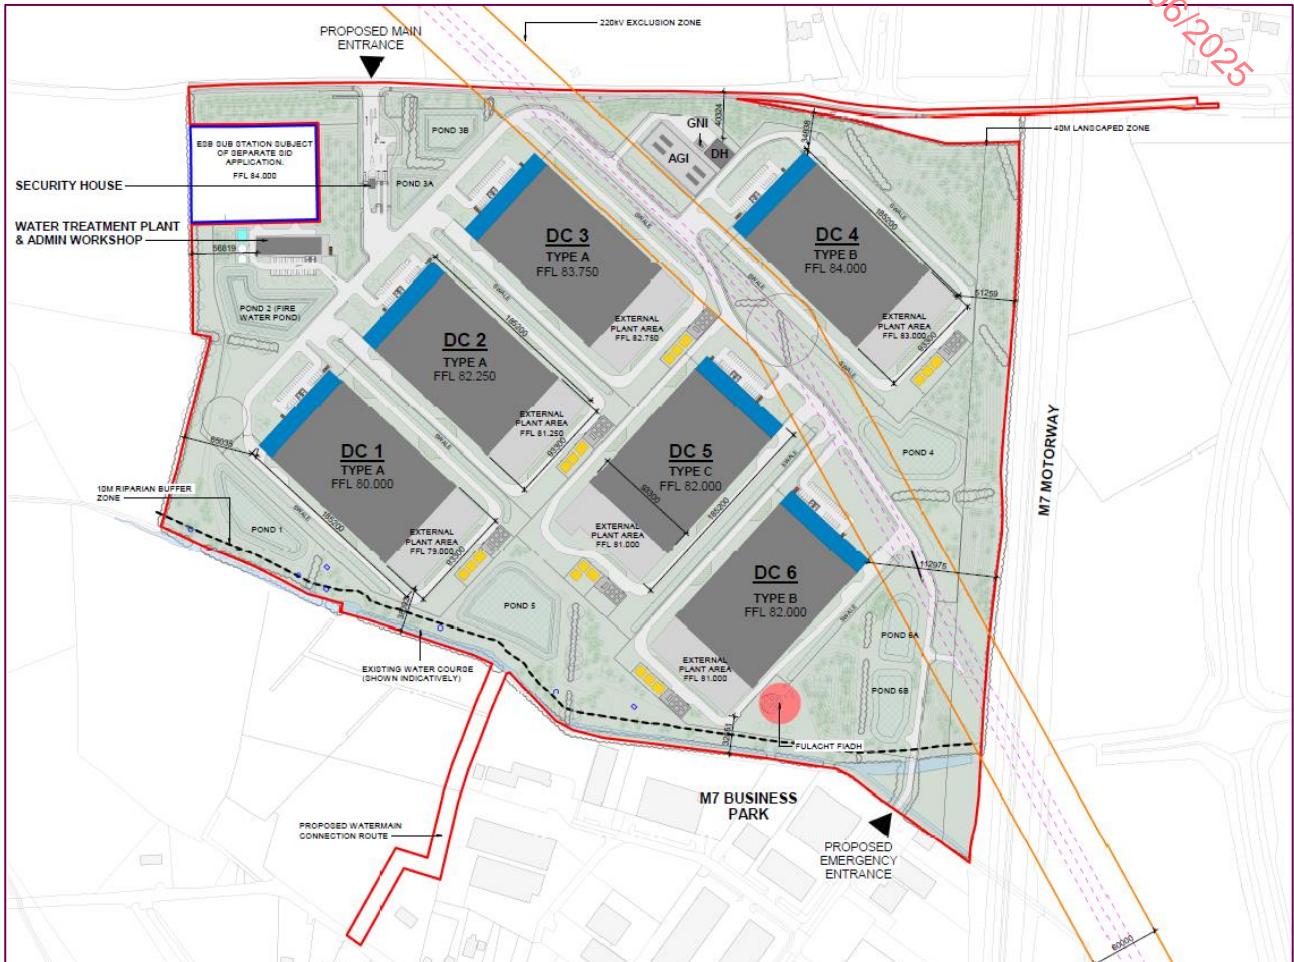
Previously Submitted Overall Proposed Site Plan (extract of submitted drawing 22217-RKD-ZZ-ZZ-DR-A-1010-OVERALL PROPOSED SITE PLAN)
